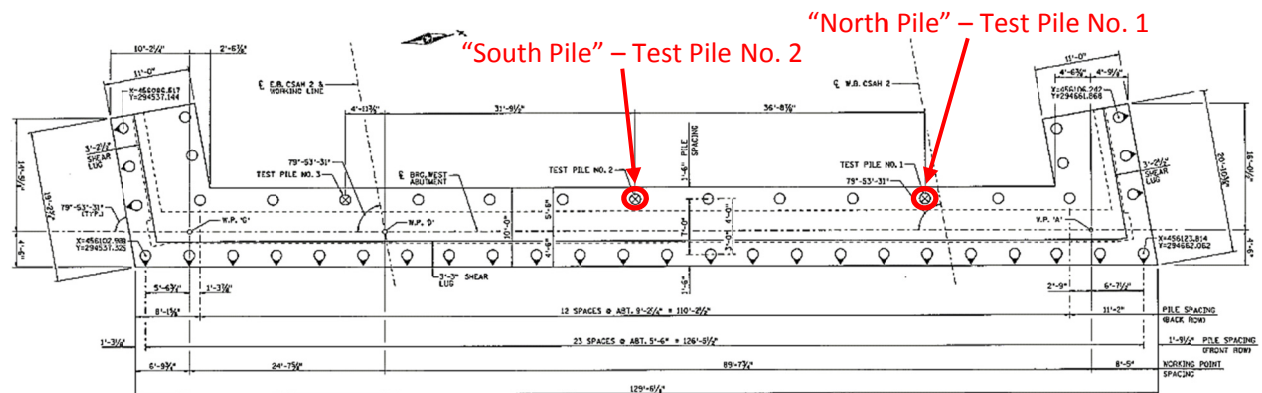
Plan view of the west abutment of Bridge 82527, showing the location of the two instrumented piles (“South Pile” – Test Pile No. 2 and “North Pile” – Test Pile No. 1) monitored on this project.
